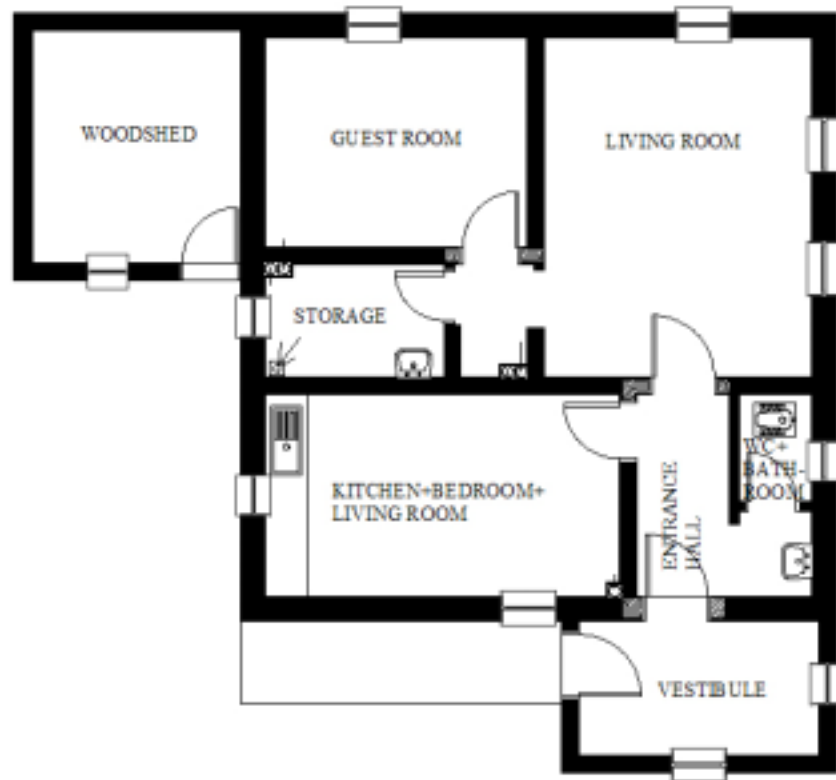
Modified plan of the PDH with *Typical Design* in Elden Village - Type 3 (75.68 m²)
